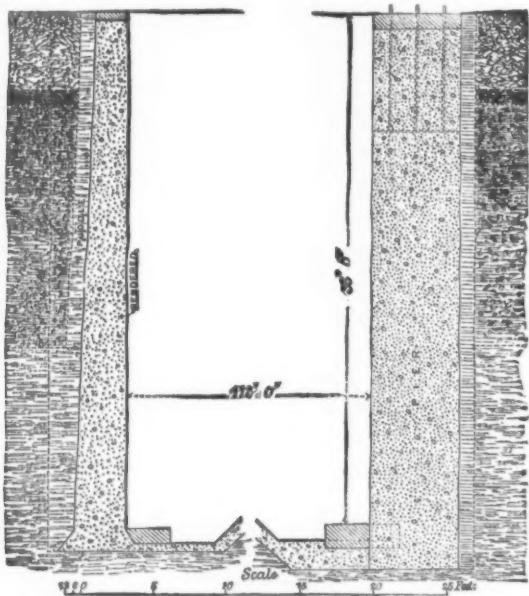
SECTIONS OF WALLS OF CONCRETE TANK.
